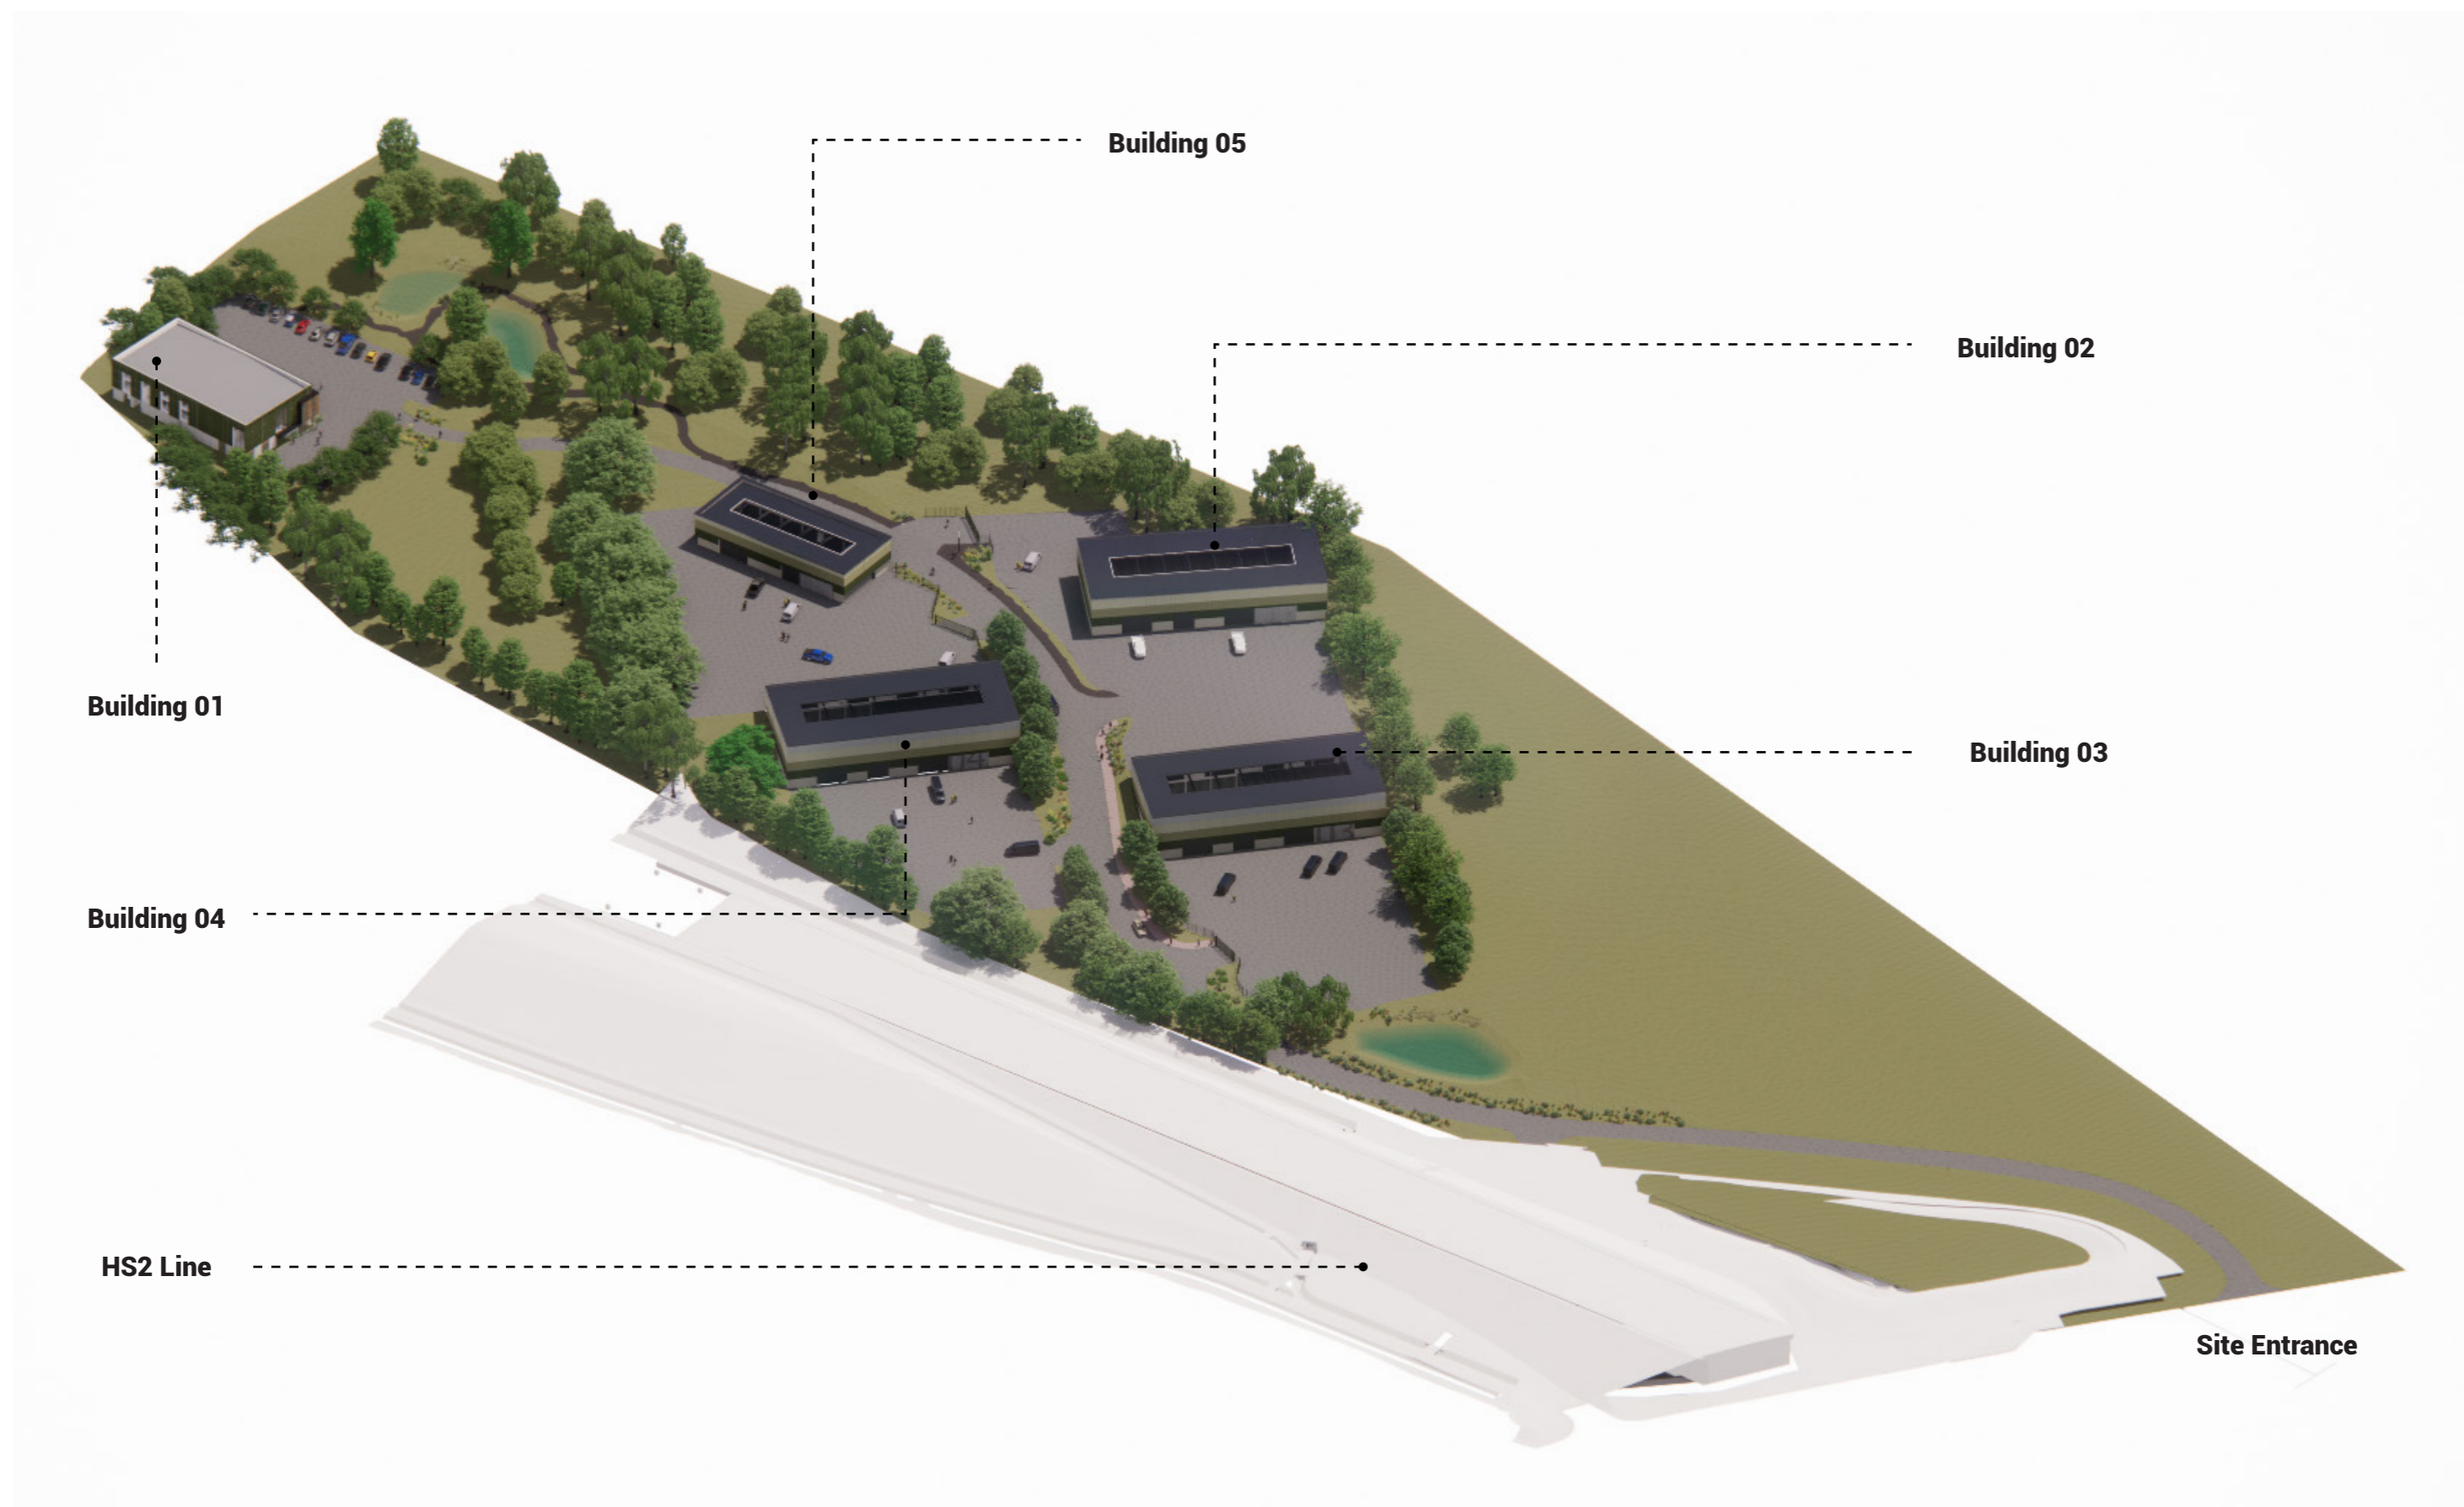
Proposed Arrangement of buildings and spaces with the existing site
